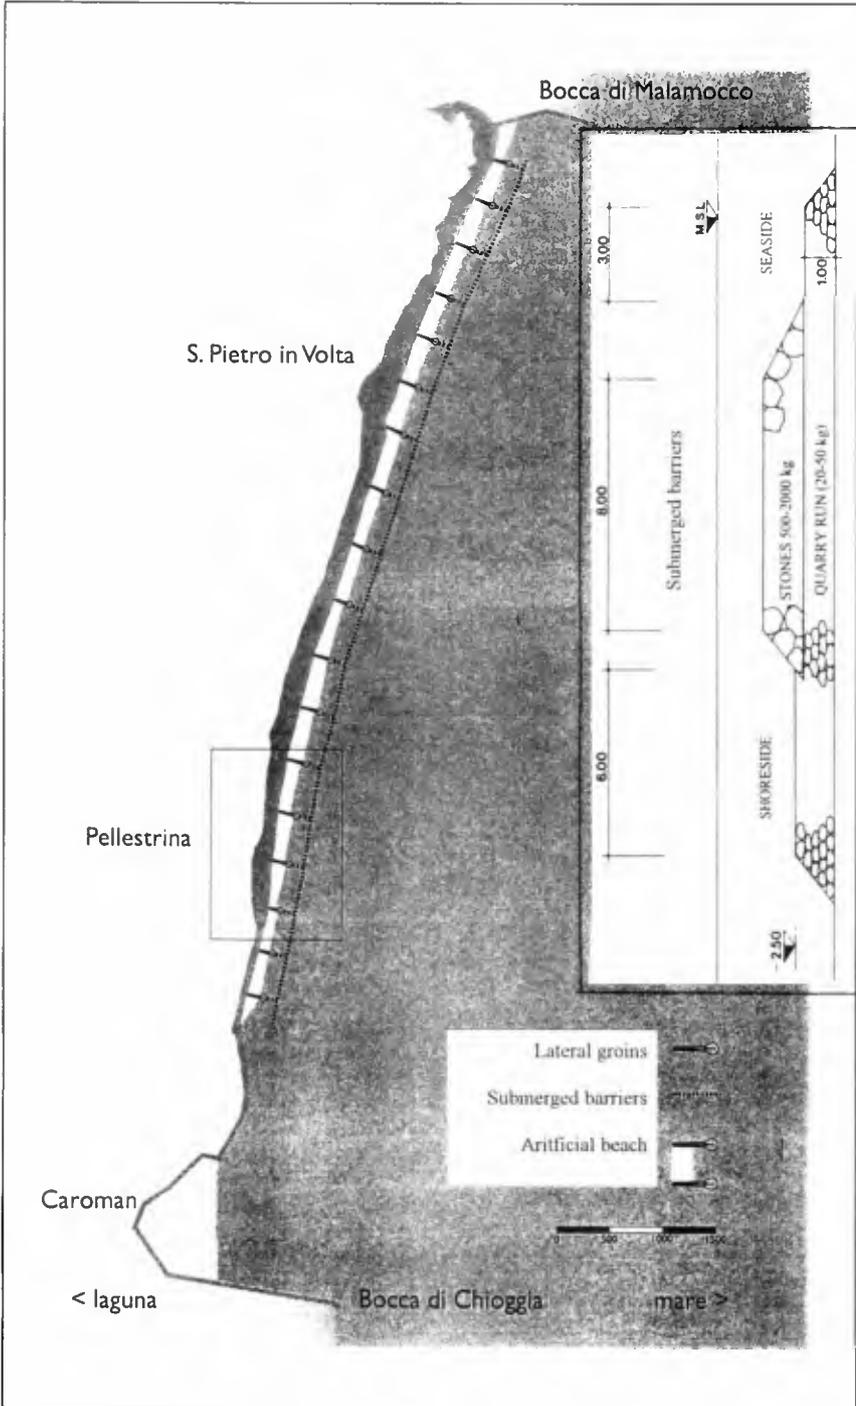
Protected nourishment at Pellestrina (VE, Veneto): plan of the area and section of the submerged barrier.
